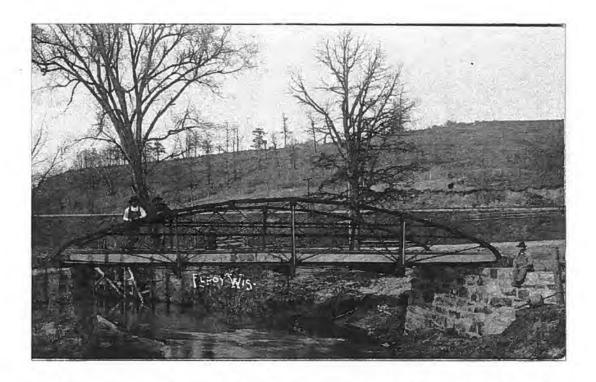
A bowstring truss located in Elroy, Wisconsin. (Source: Collection of Robert Newbery).
